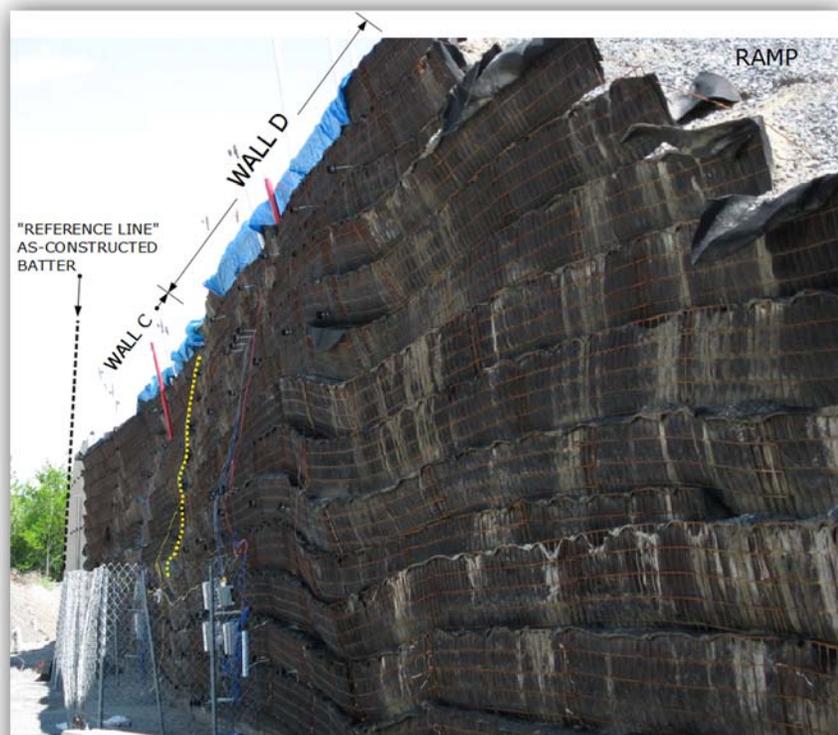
Wall D (60% Fines, NWGT Reinforcement), Aug. 2006
